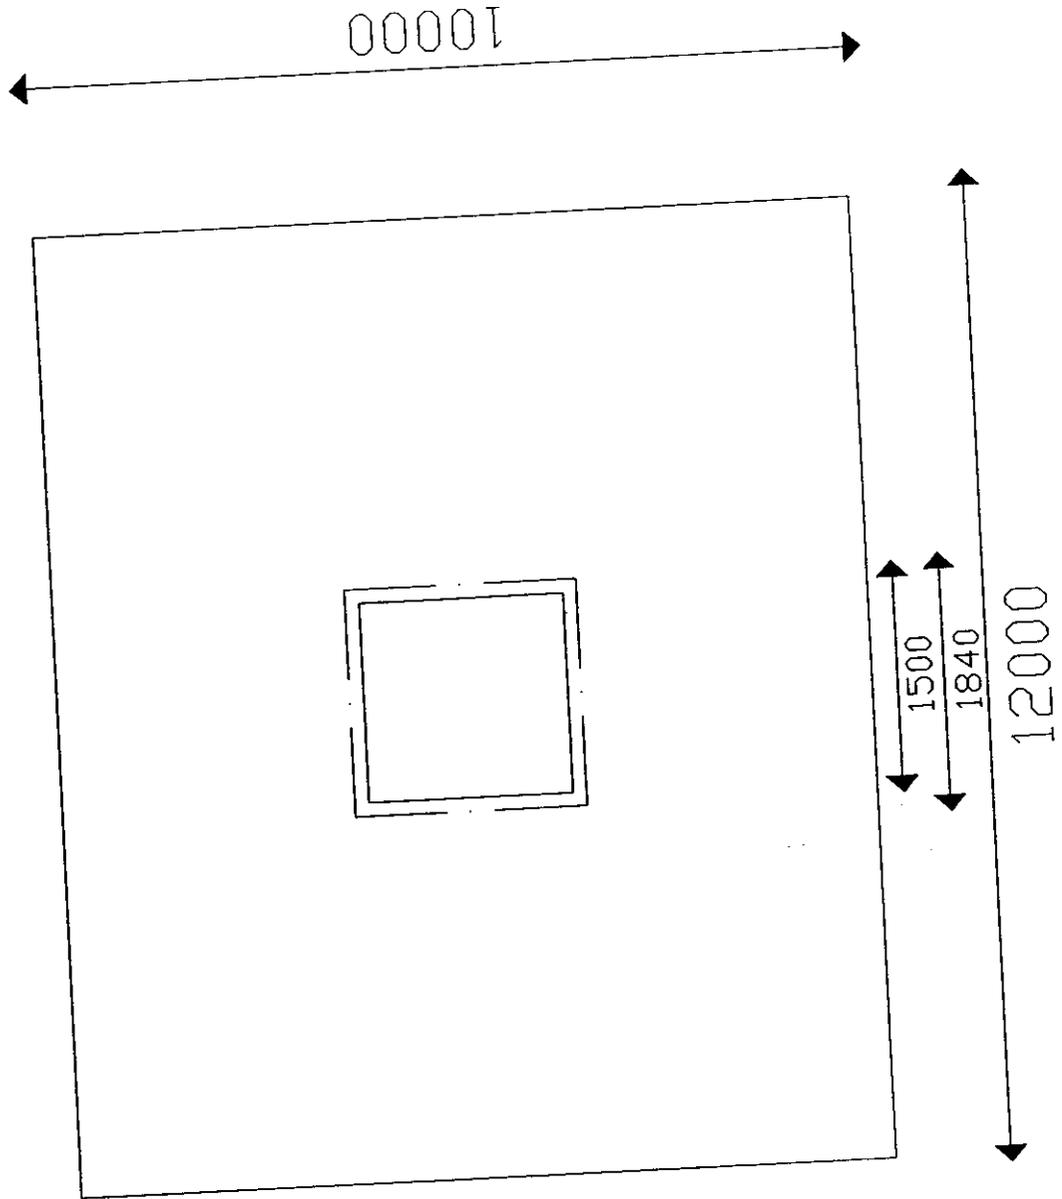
REINFORCEMENT DETAILING OF FLAT SLAB
